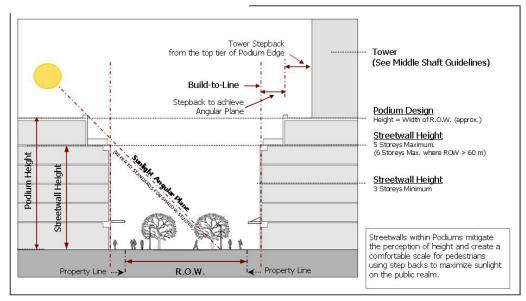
Podiums and their streetwalls will be designed with stepbacks at the upper storeys to provide light filled sidewalks and boulevards in the Downtown Core.
